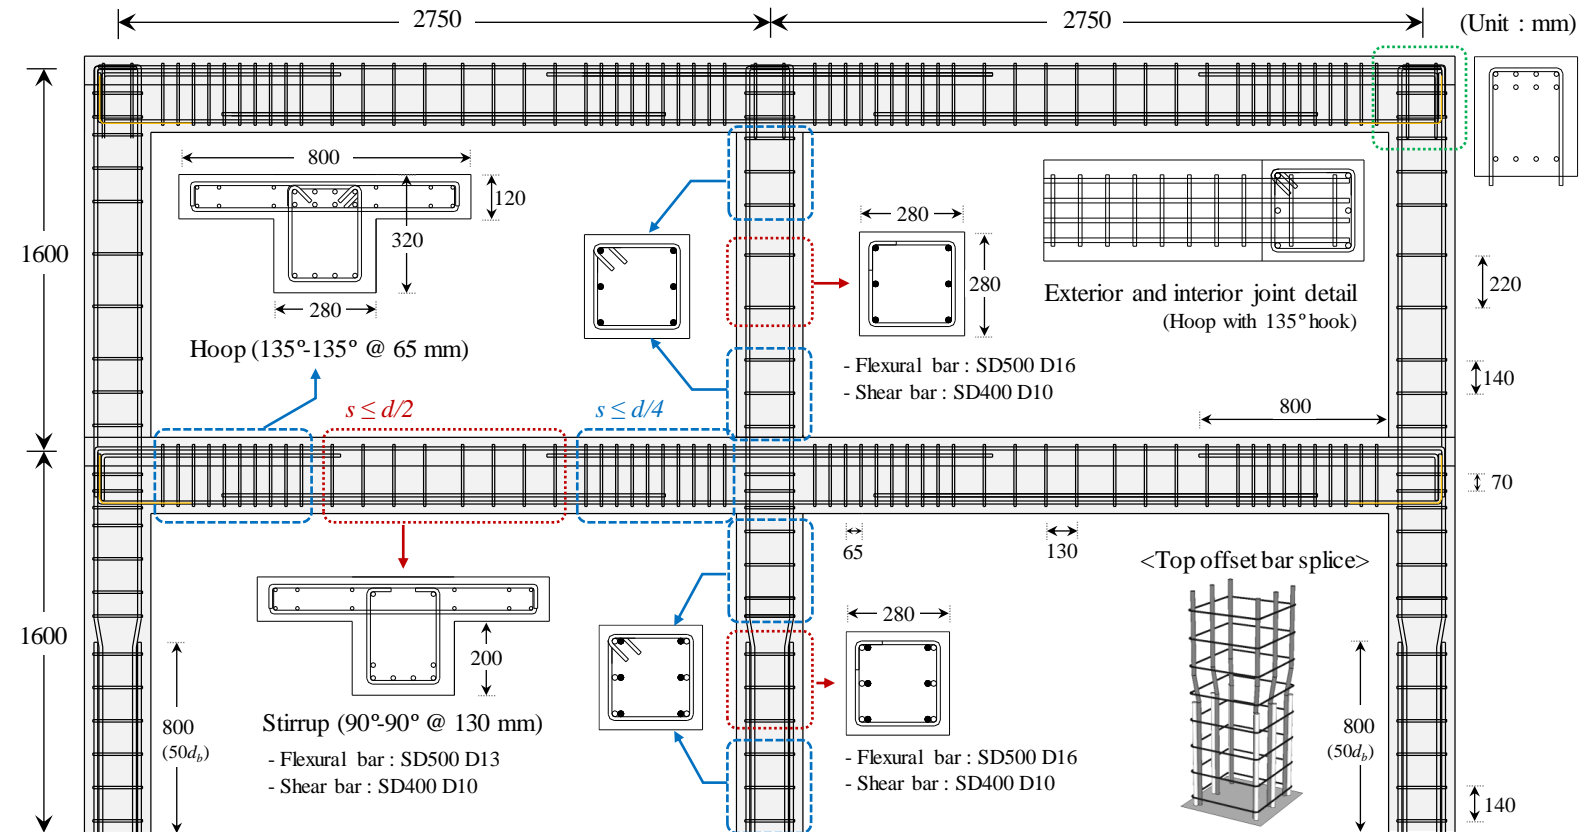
Dimensions and reinforcement details of the intermediate moment frame specimen (IMF)
